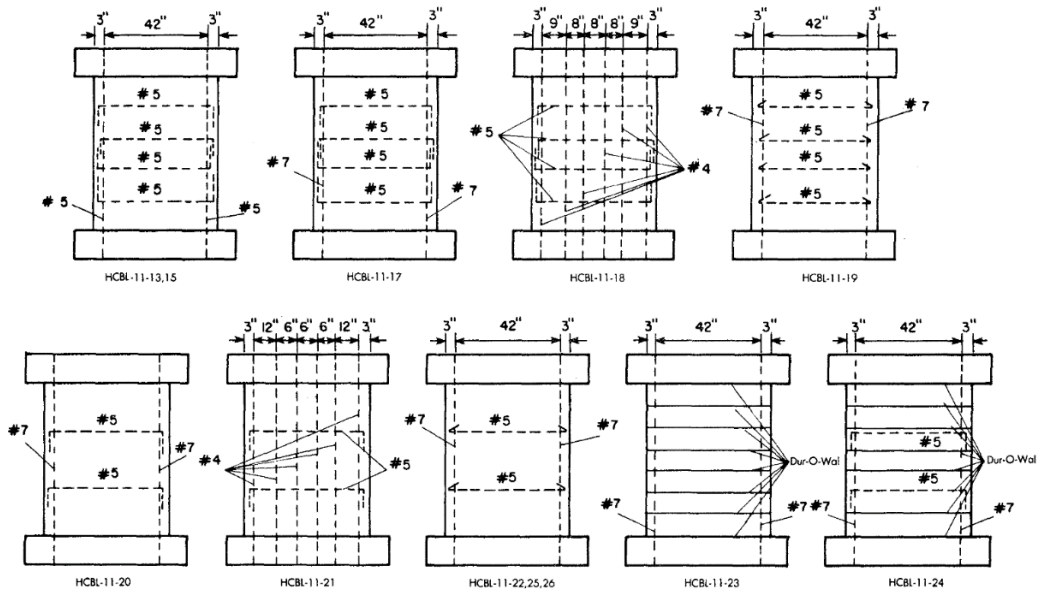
Single-Pier Specimen Reinforcing Details (Sviensson et al., 1985)
